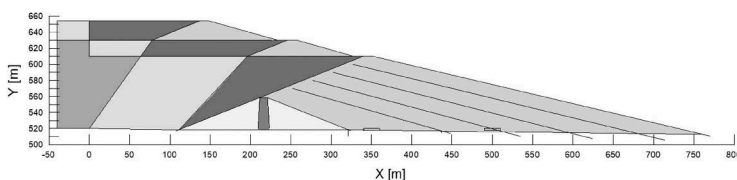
Construction of the tailings dam up to the elevation of 654 masl (2nd phase, stage 2).
